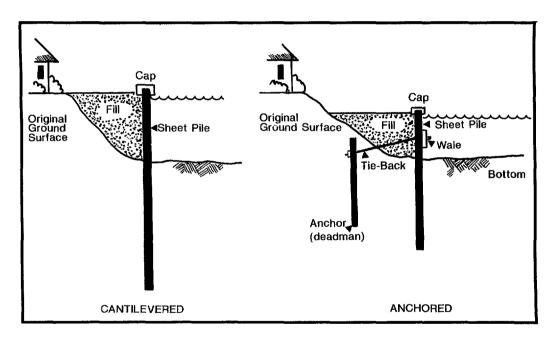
Cantilevered and anchored sheet pile bulkheads.
